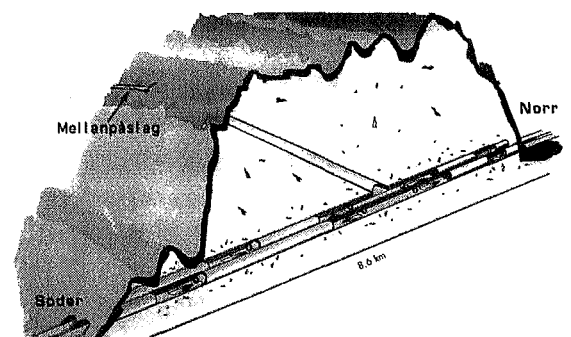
Longitudinal section of the railway tunnels (Peter Lönegård, Nyhetsbrev, Väst kustbanan.)
